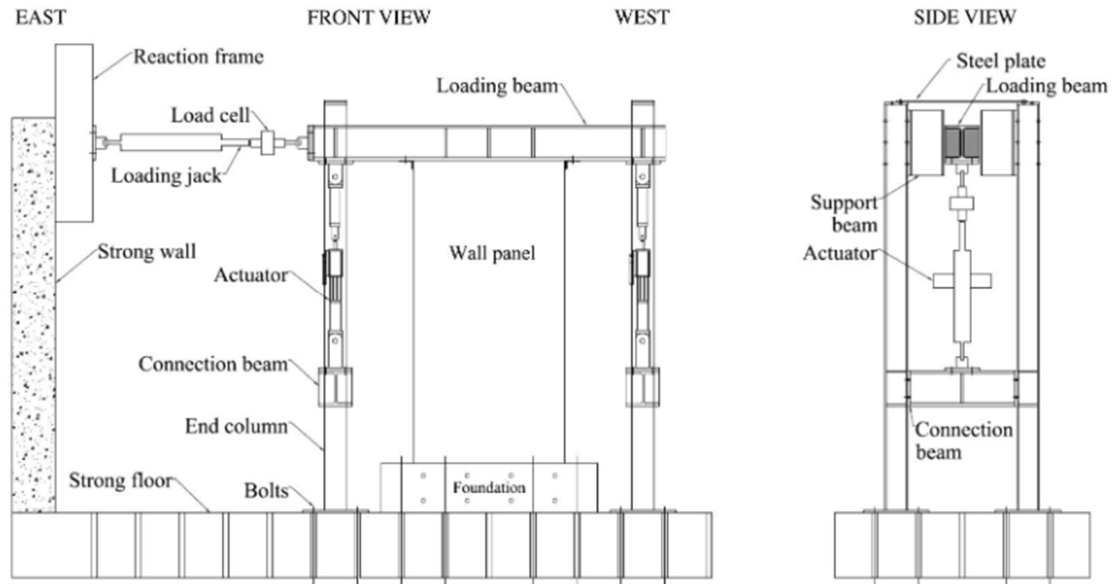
Test Setup for Shear Wall Testing, Lu et al. (2017)
